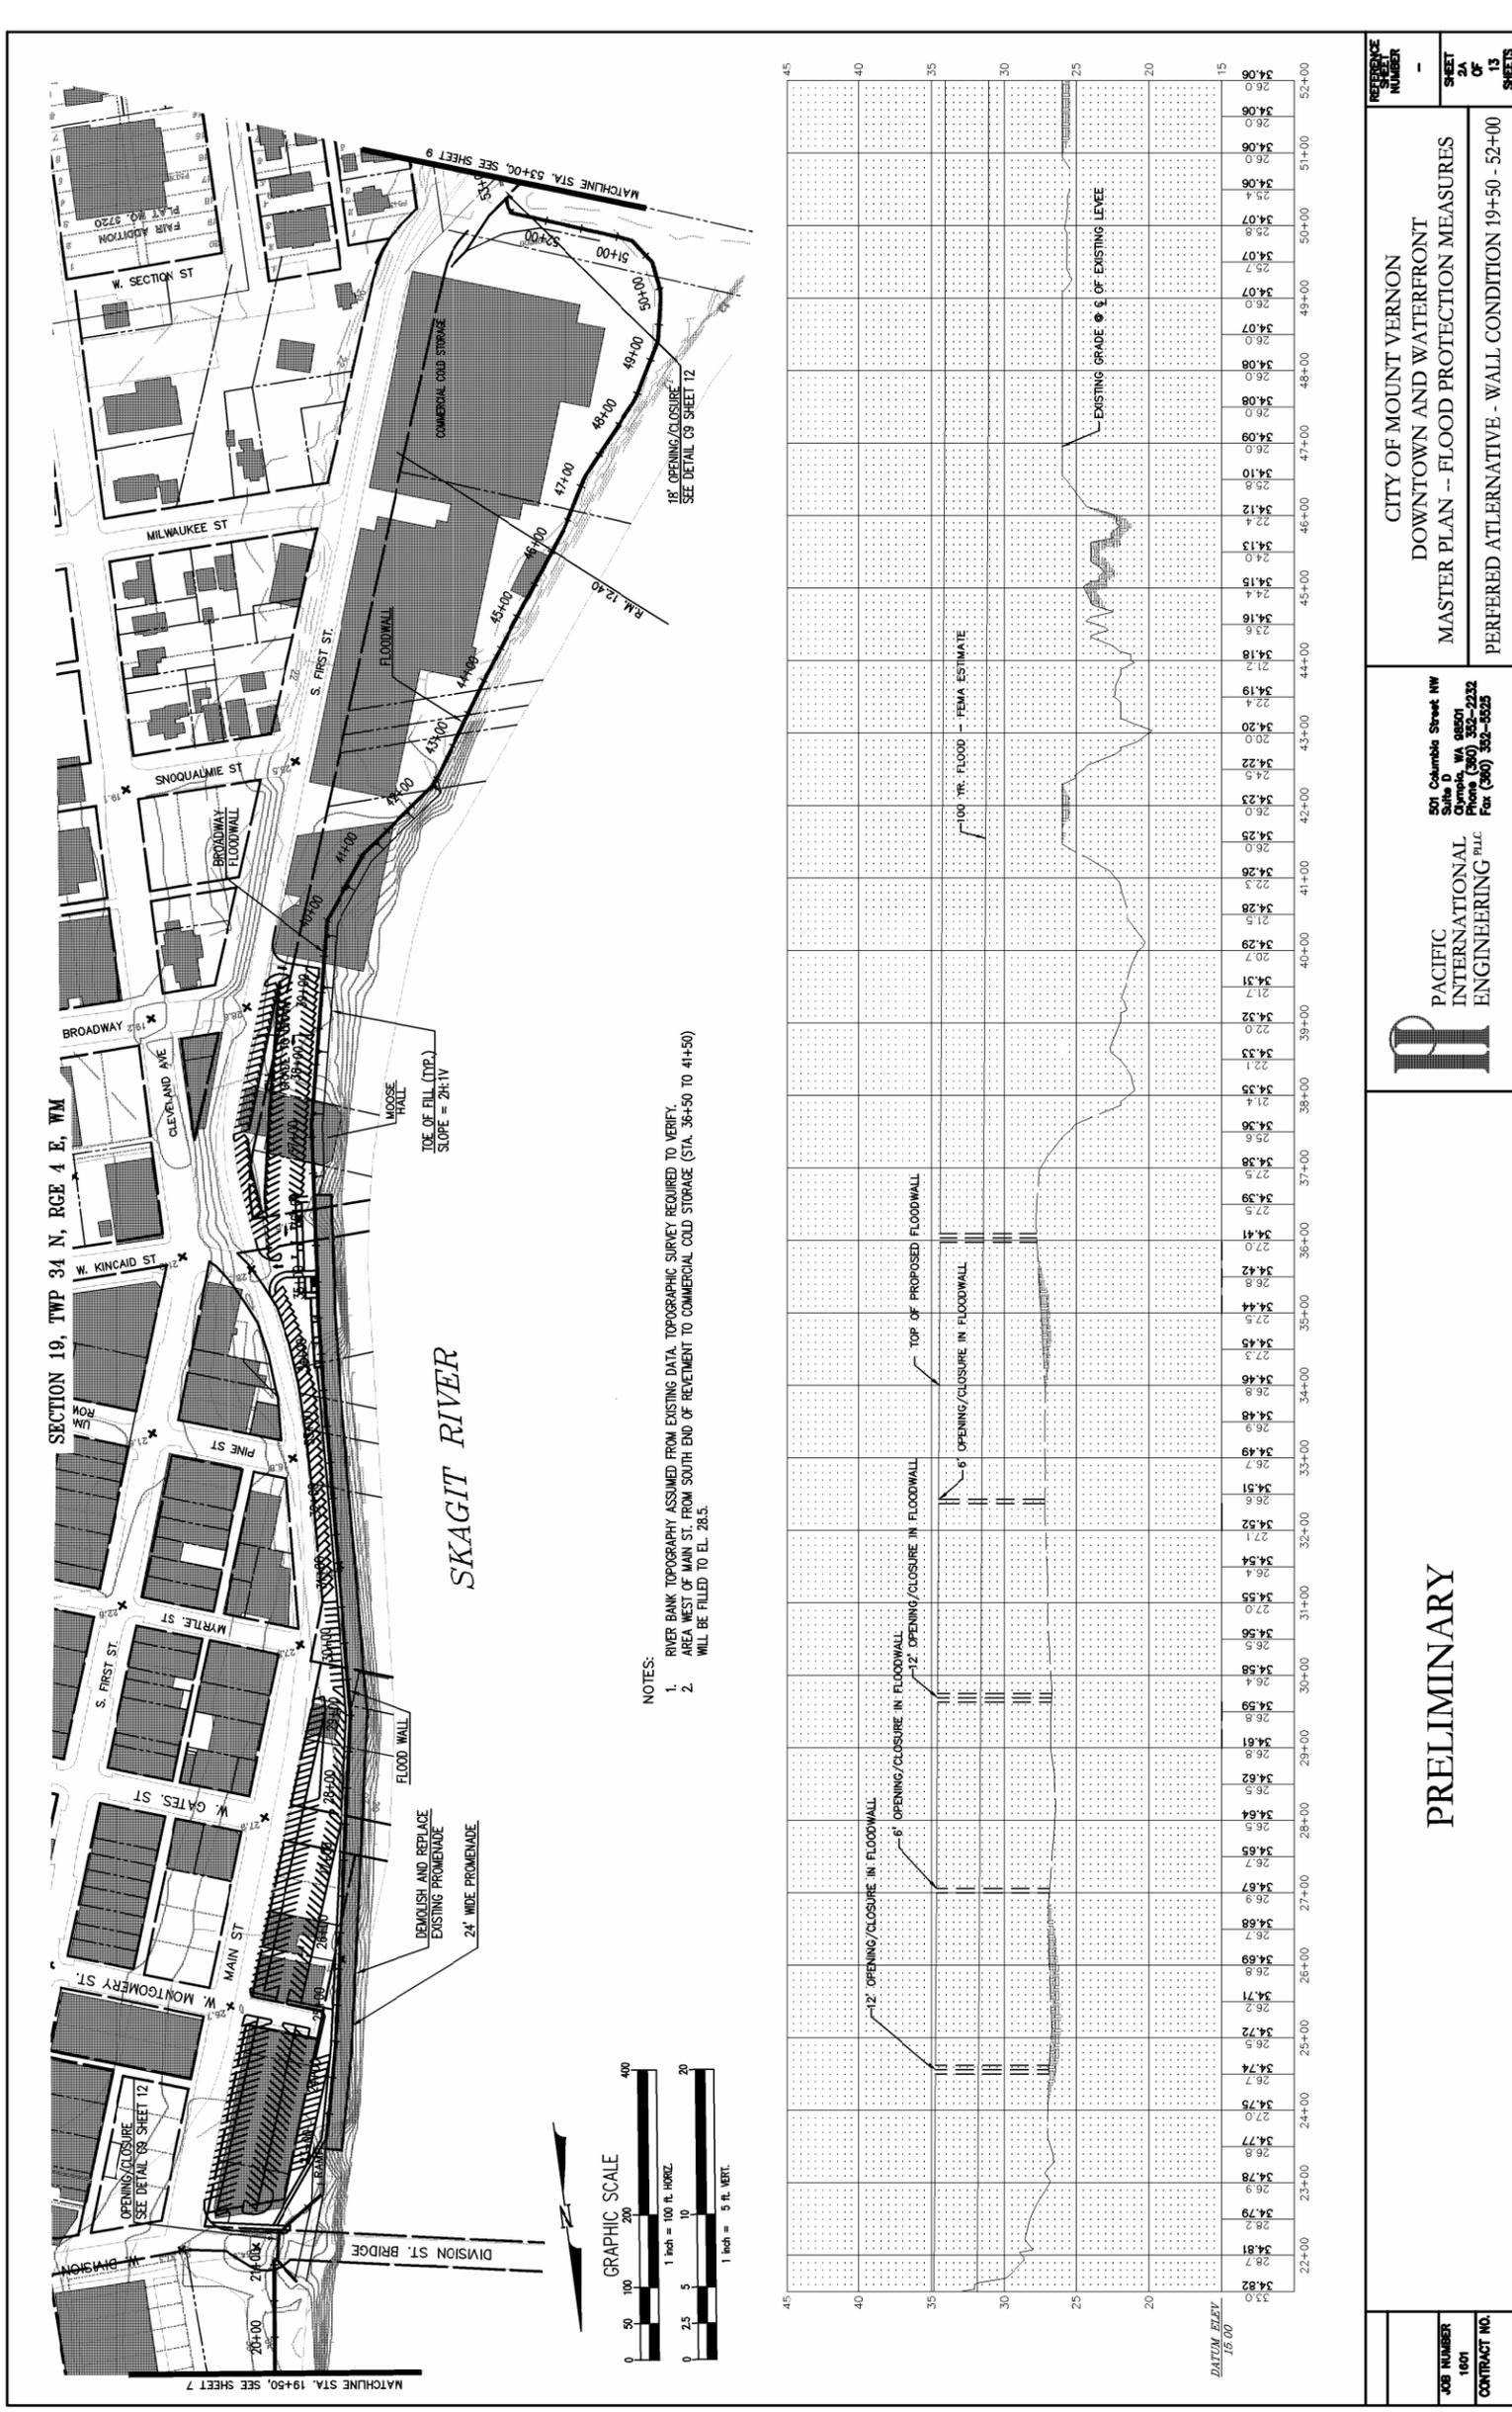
Preferred Alternative – Wall Condition – Station 19+50 – Station 52+00
